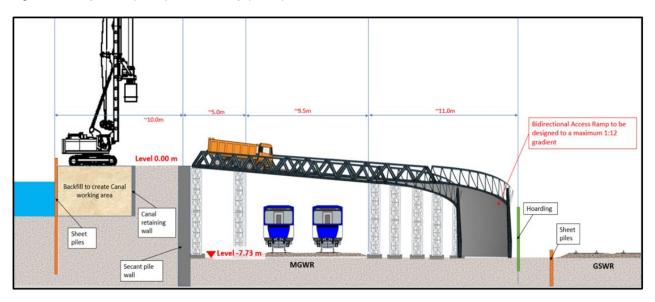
Indicative Cross Section of a Temporary Bridge Structure Over MGWR
